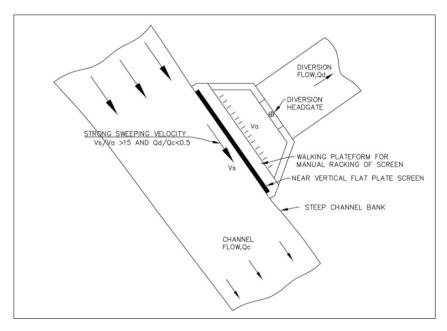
Typical Fixed Flat Plate Bank or Wall Screen Application
